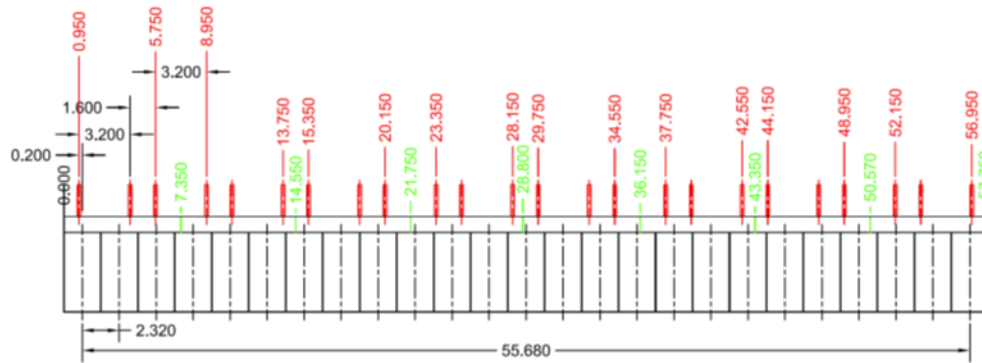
Layout of Roof Penetrations and Detector Hangars
